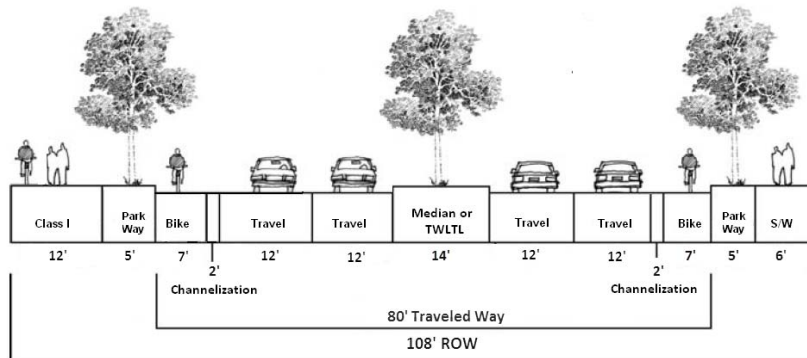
Parkway Arterial – Conceptual Typical Urban Tank Farm Road Cross-Section (4 lanes)
